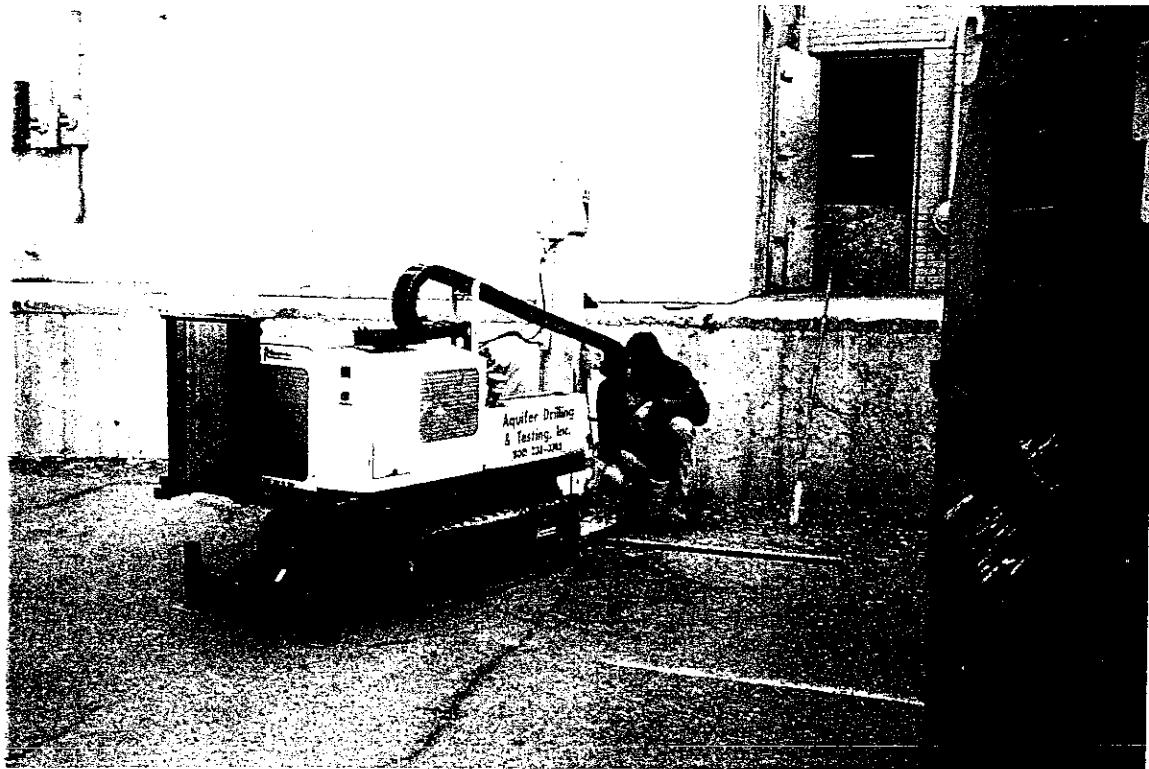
View of track-mounted geoprobe machine installing SB-1.
